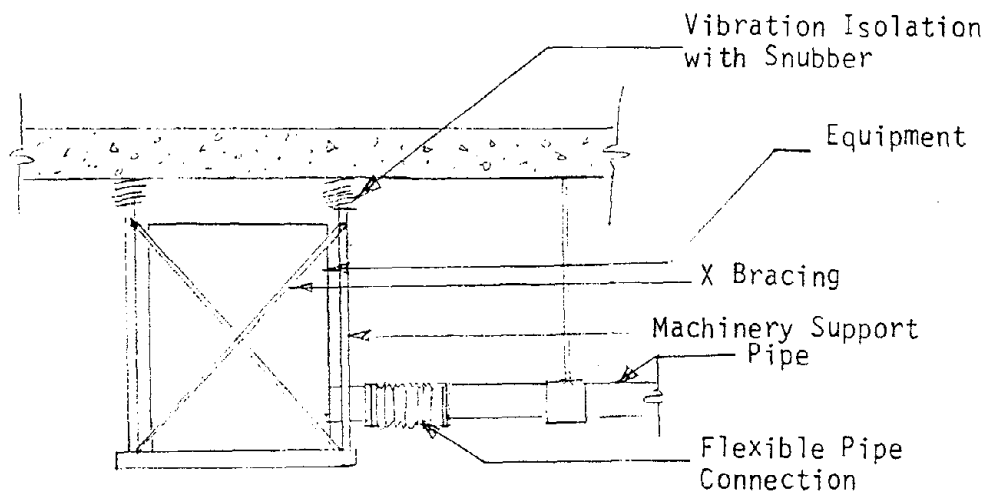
Flexible Pipe Connection at Machinery Interface (71)
